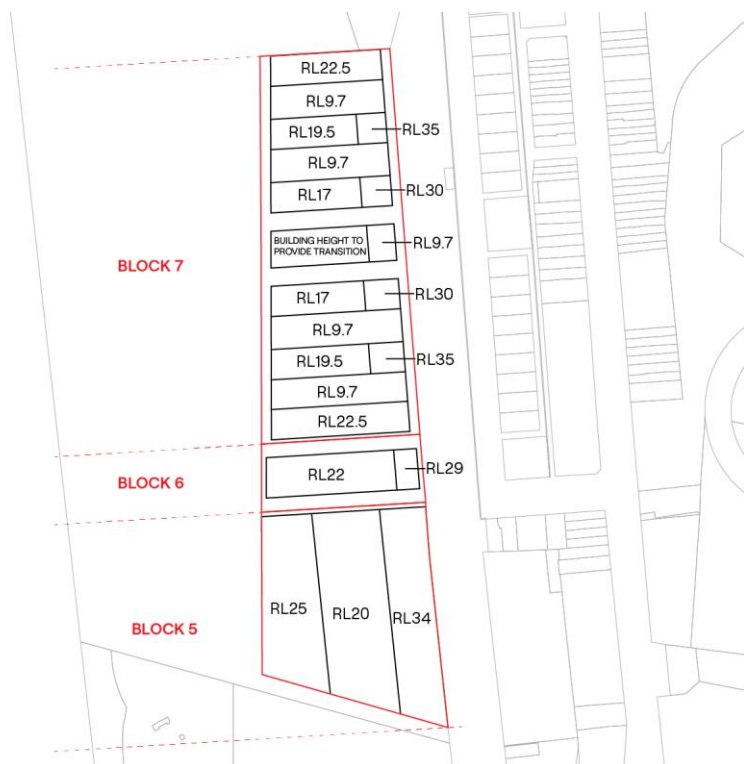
Indicative Built Form under the Concept Plan. (Source: Gyde Consulting).
